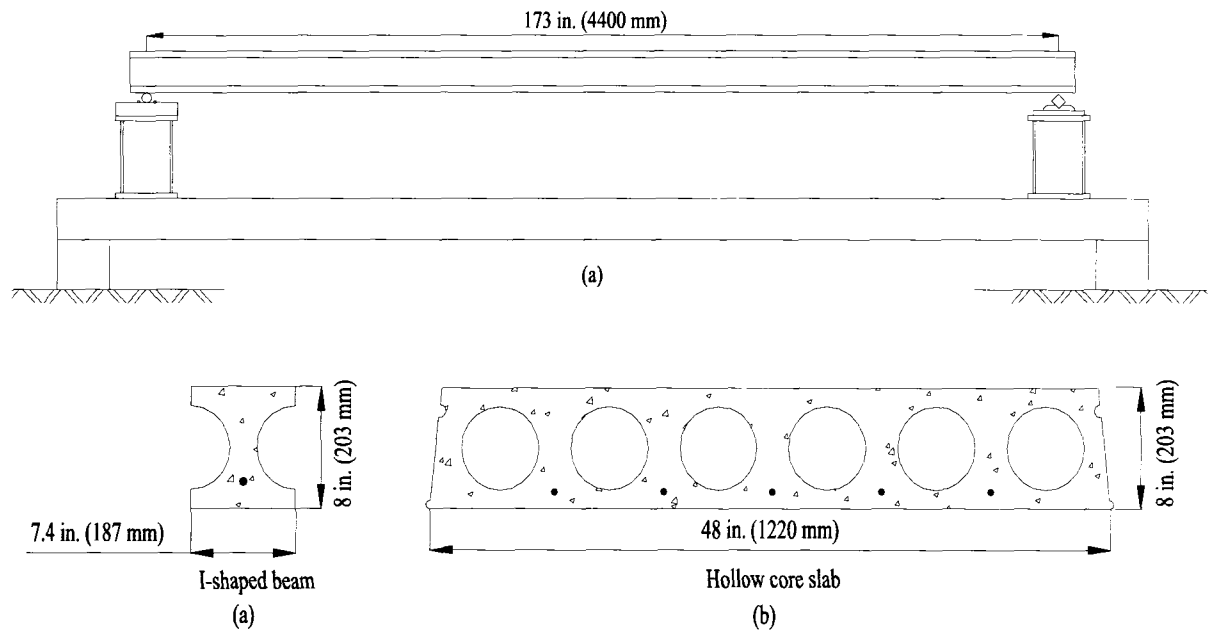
Elevation and cross sections (a) Elevation of beam and slab (b) Cross section of beam (c) Cross section of slab
